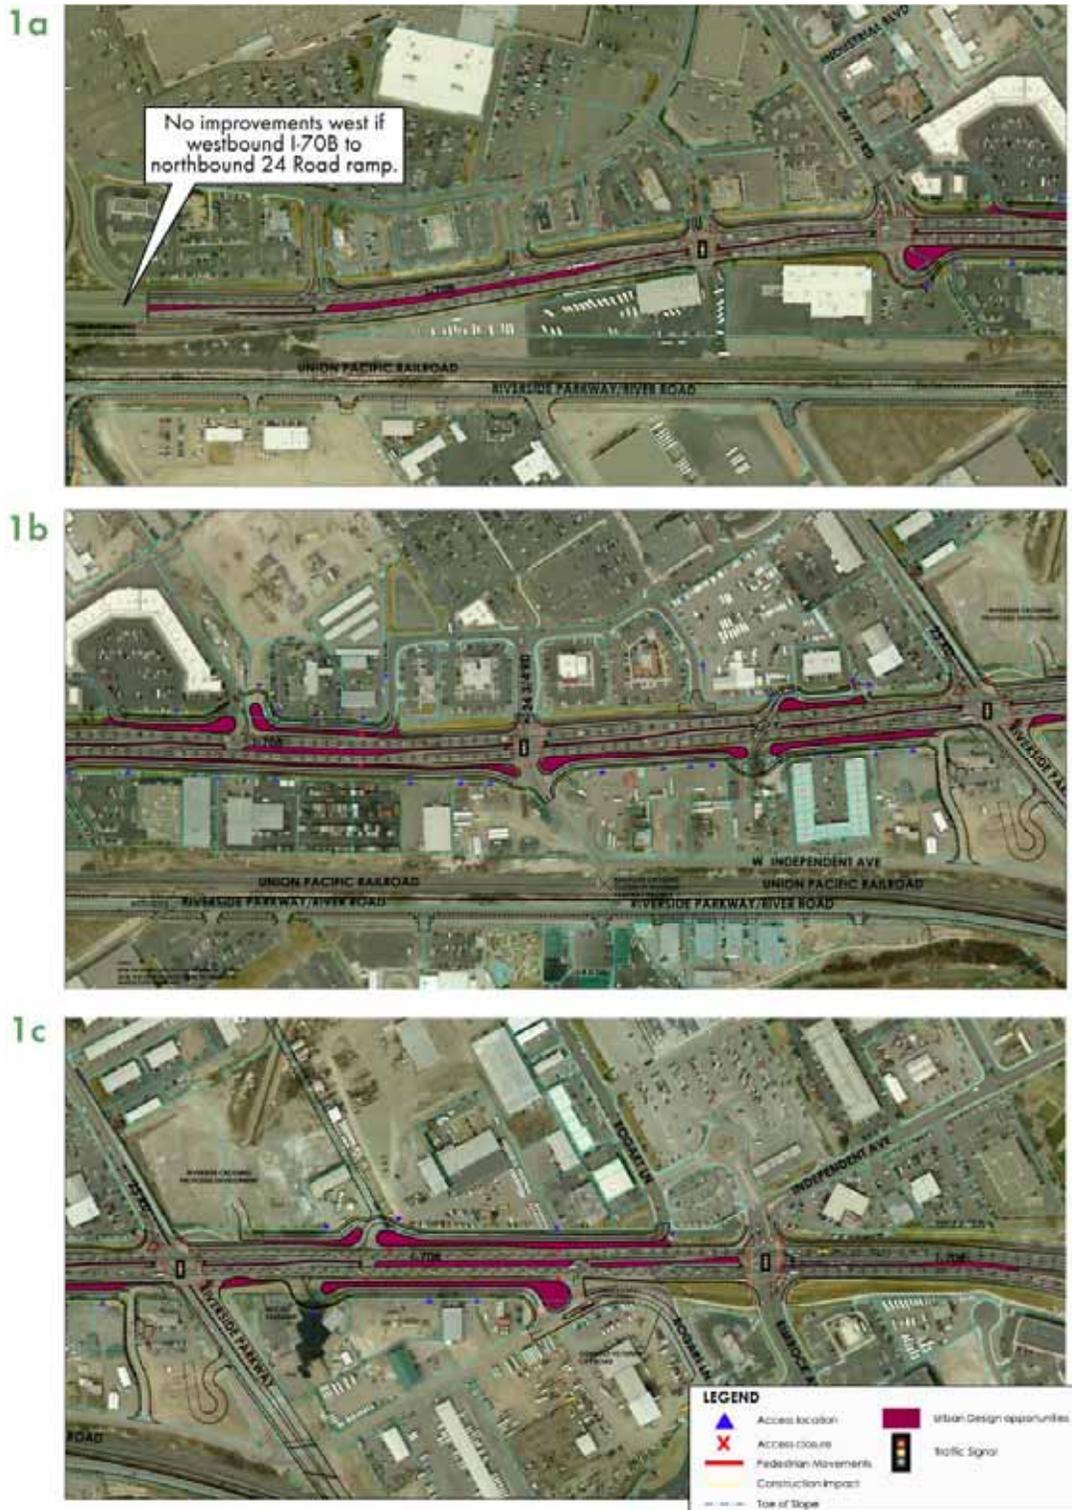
Preferred Alternative – Section 1: 24 Road to Rimrock Avenue
